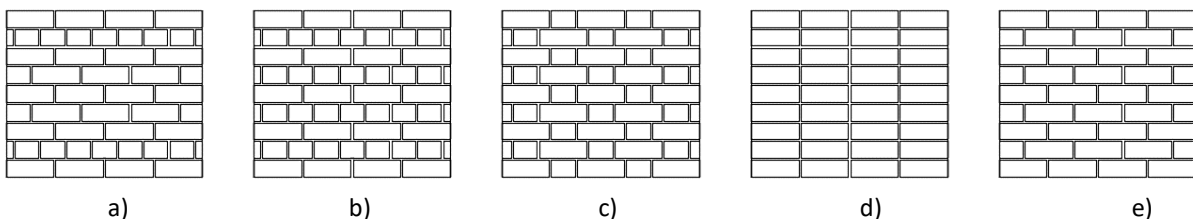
Masonry of various units' arrangements: a) American bond, b) English bond, c) Flemish bond, d) Stack bond, e) Stretcher bond. Lourenço, P.B. [11].
